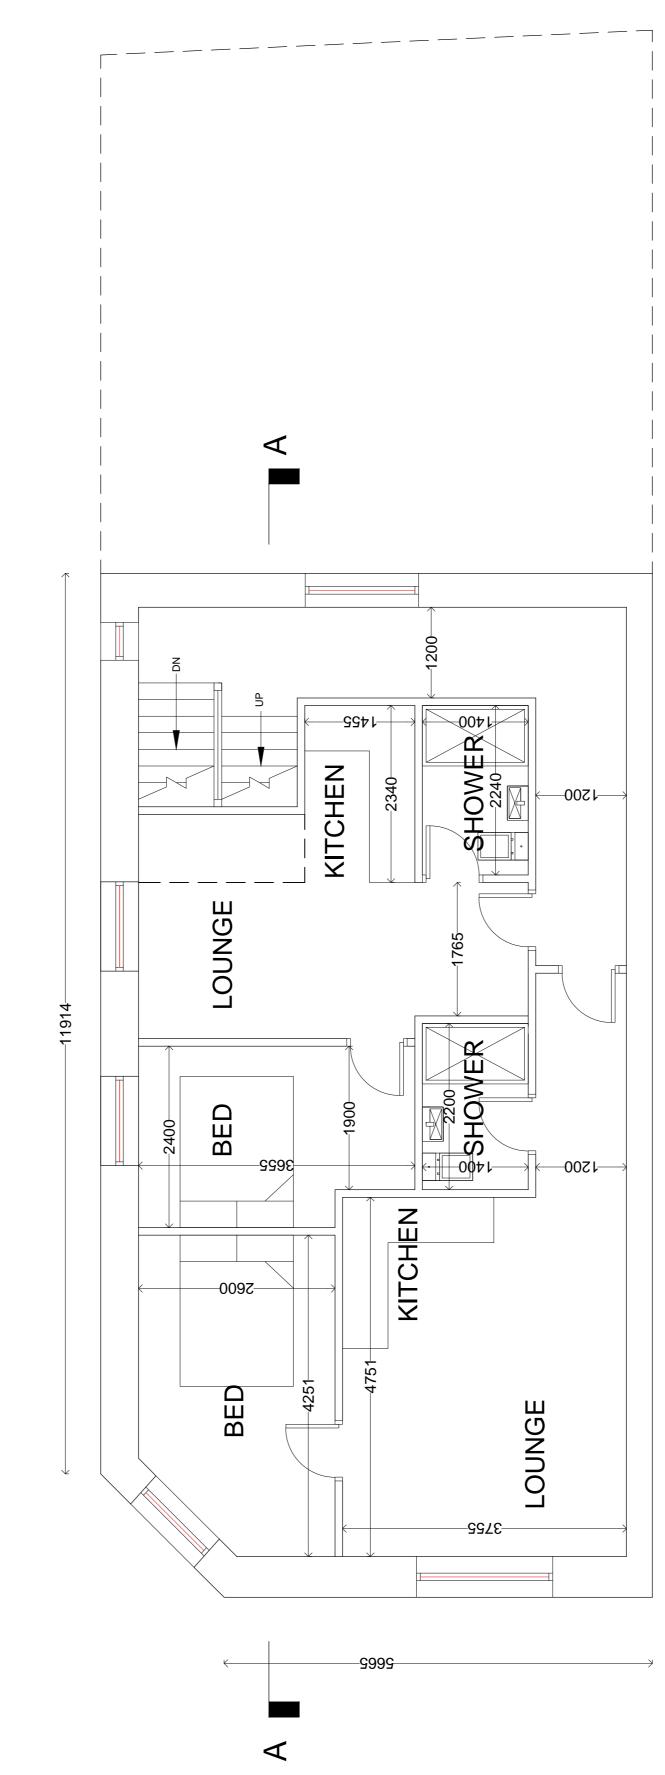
/01 Rev. C - Proposed Floor Plans, dated 25/09/15.
